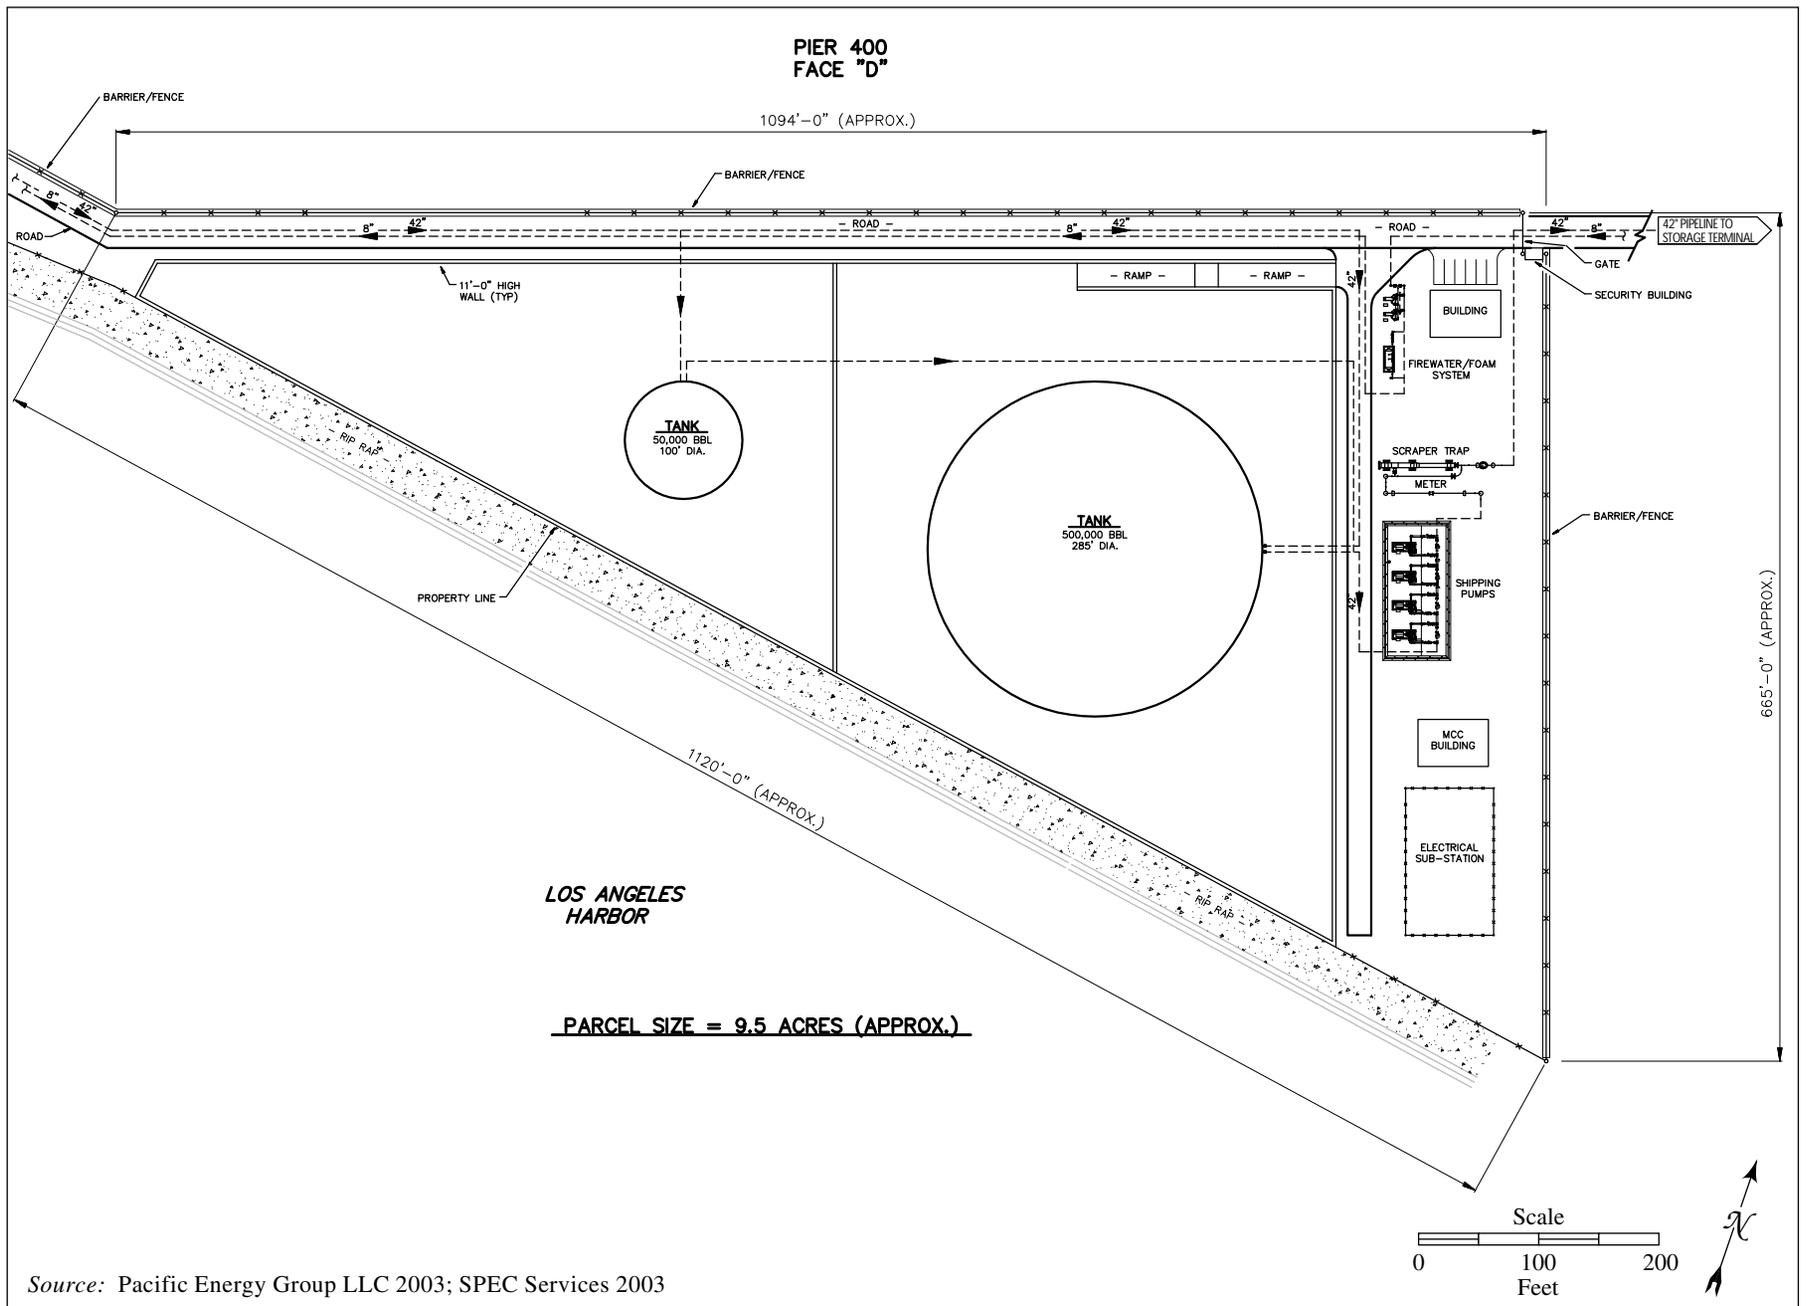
Face D of the Proposed Crude Oil Marine Terminal on Pier 400
